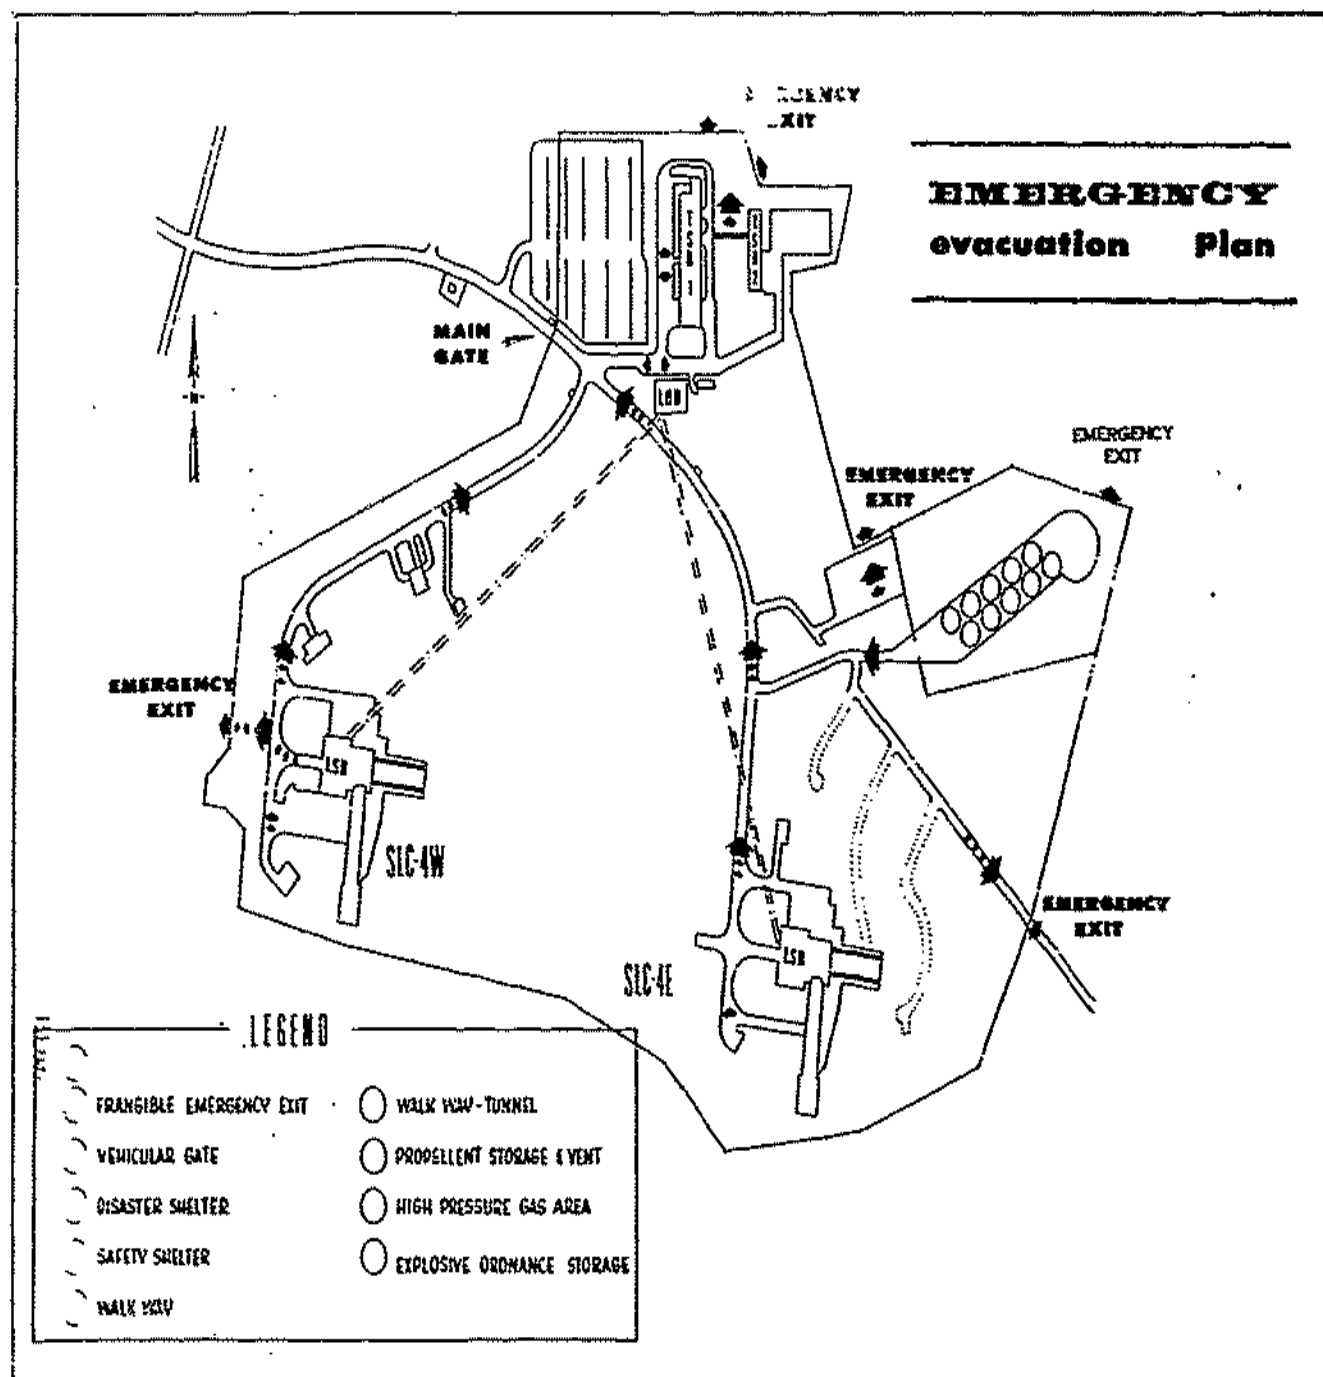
SLC-4 Site Plan (Safety Control Areas).
